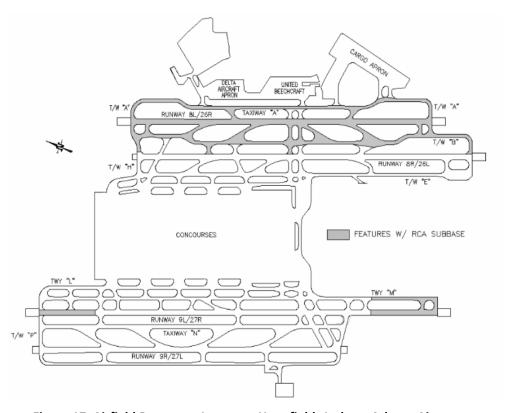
Airfield Pavement Layout at Hartsfield- Jackson Atlanta Airport Showing Features with RCA Base [8]
